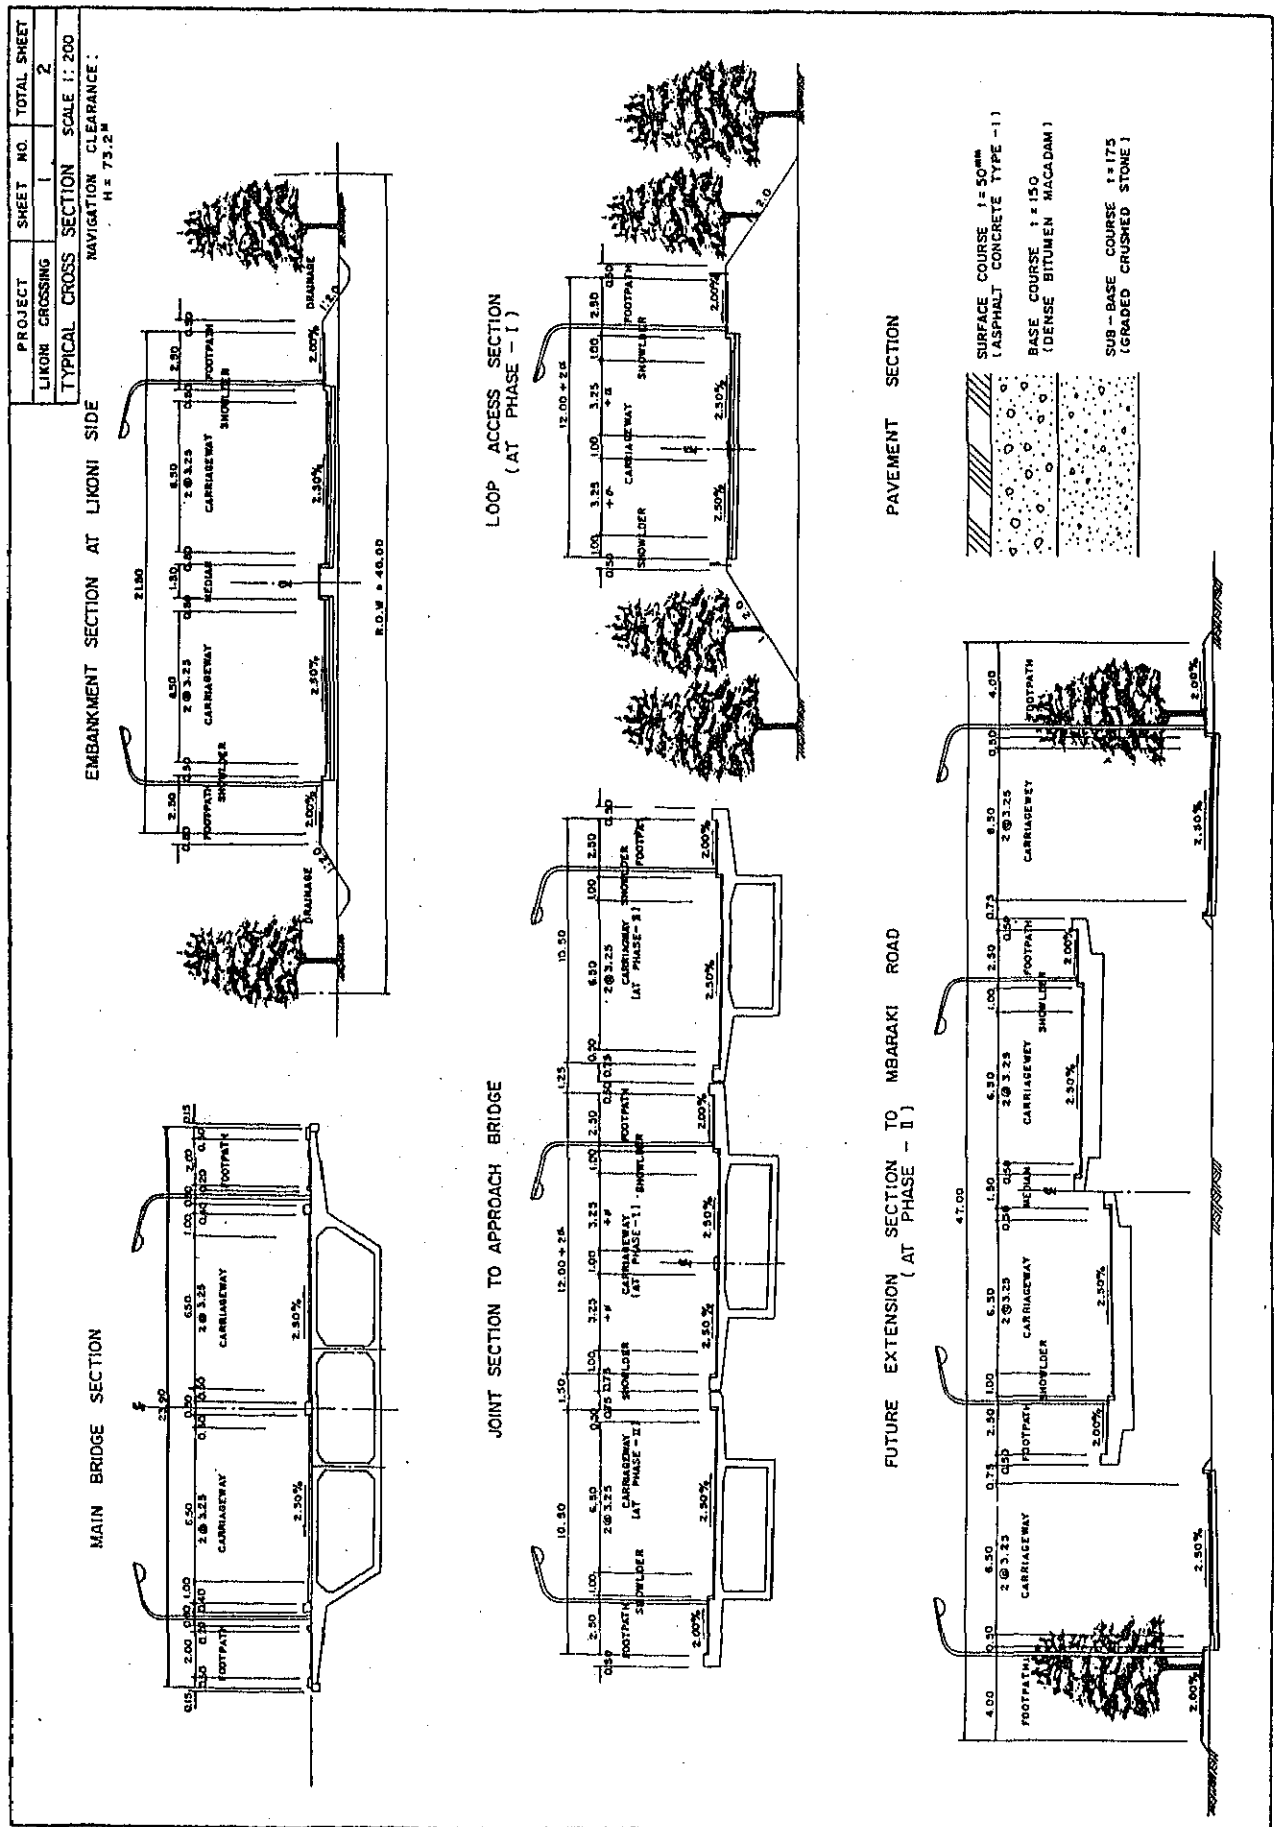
TYPICAL CROSS SECTION (H = 73.2 M)
